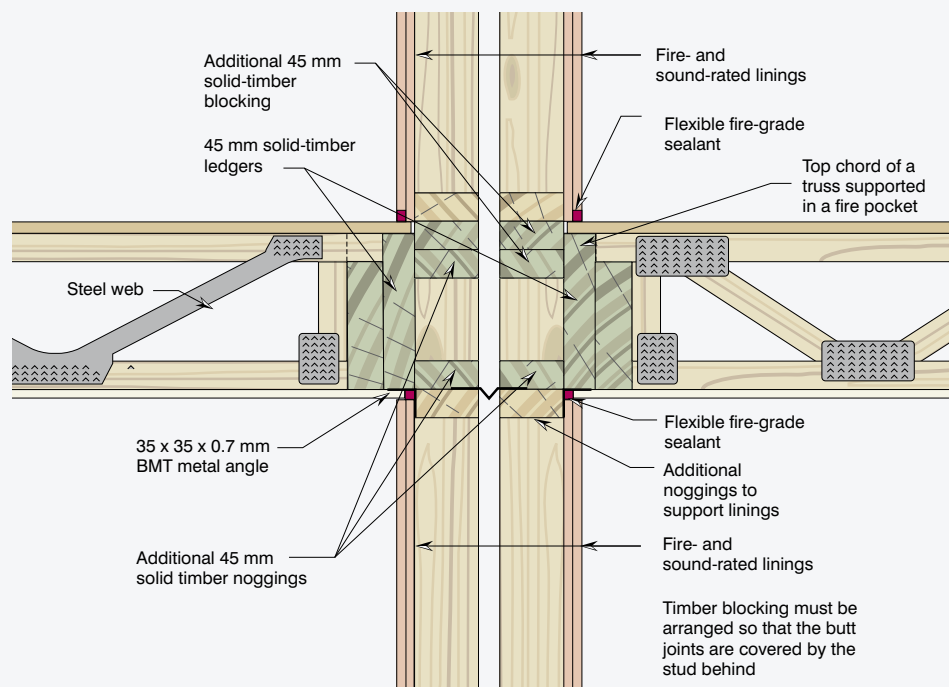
Alternative floor-truss top chord support – FRL 90 minutes – elevation view.
